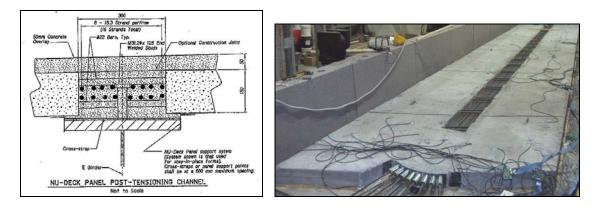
Longitudinal post-tensioning concentrated at girder lines used on the Skyline Drive Bridge, Omaha, Nebraska
